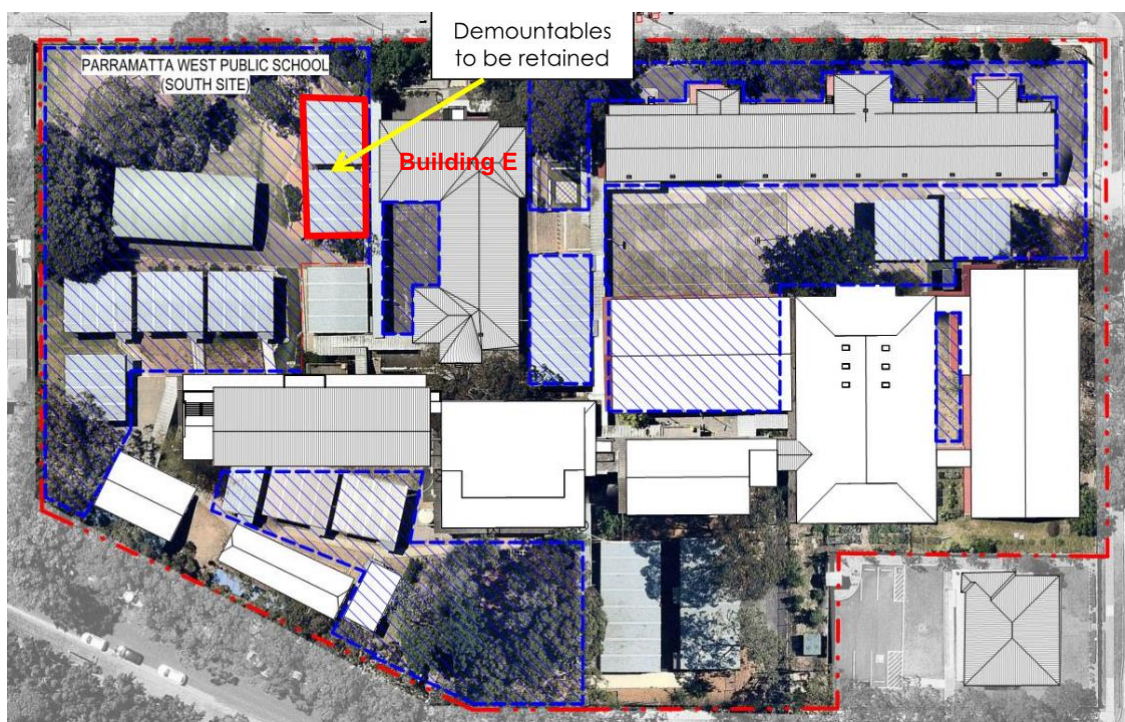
Aerial photo showing the south side of Parramatta West Public School and proposed locations (marked with red outline) demountable structures to be retained on the west side of Building E. (Source: Barker Ryan Stewart)
